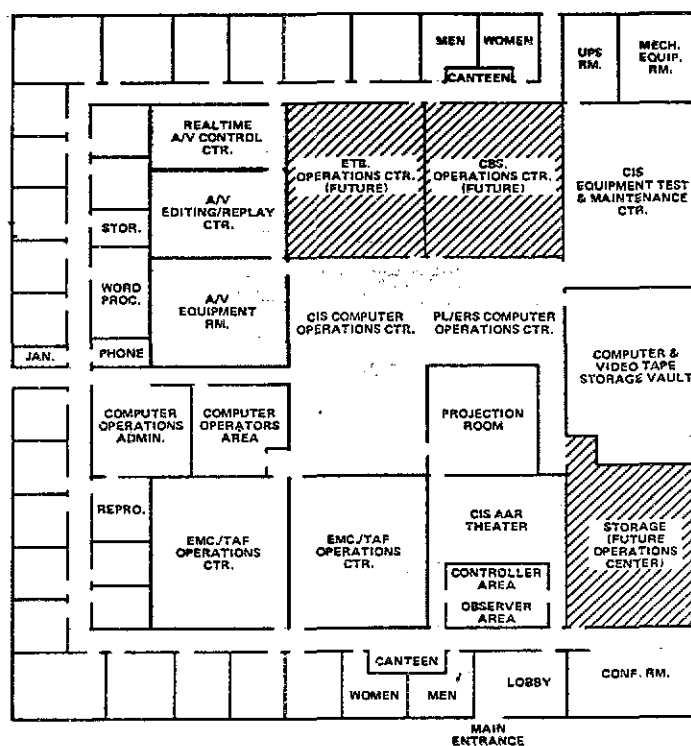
FLOOR PLAN CIS ENVIRONMENTAL PROTECTION SHELTER (EPS)
